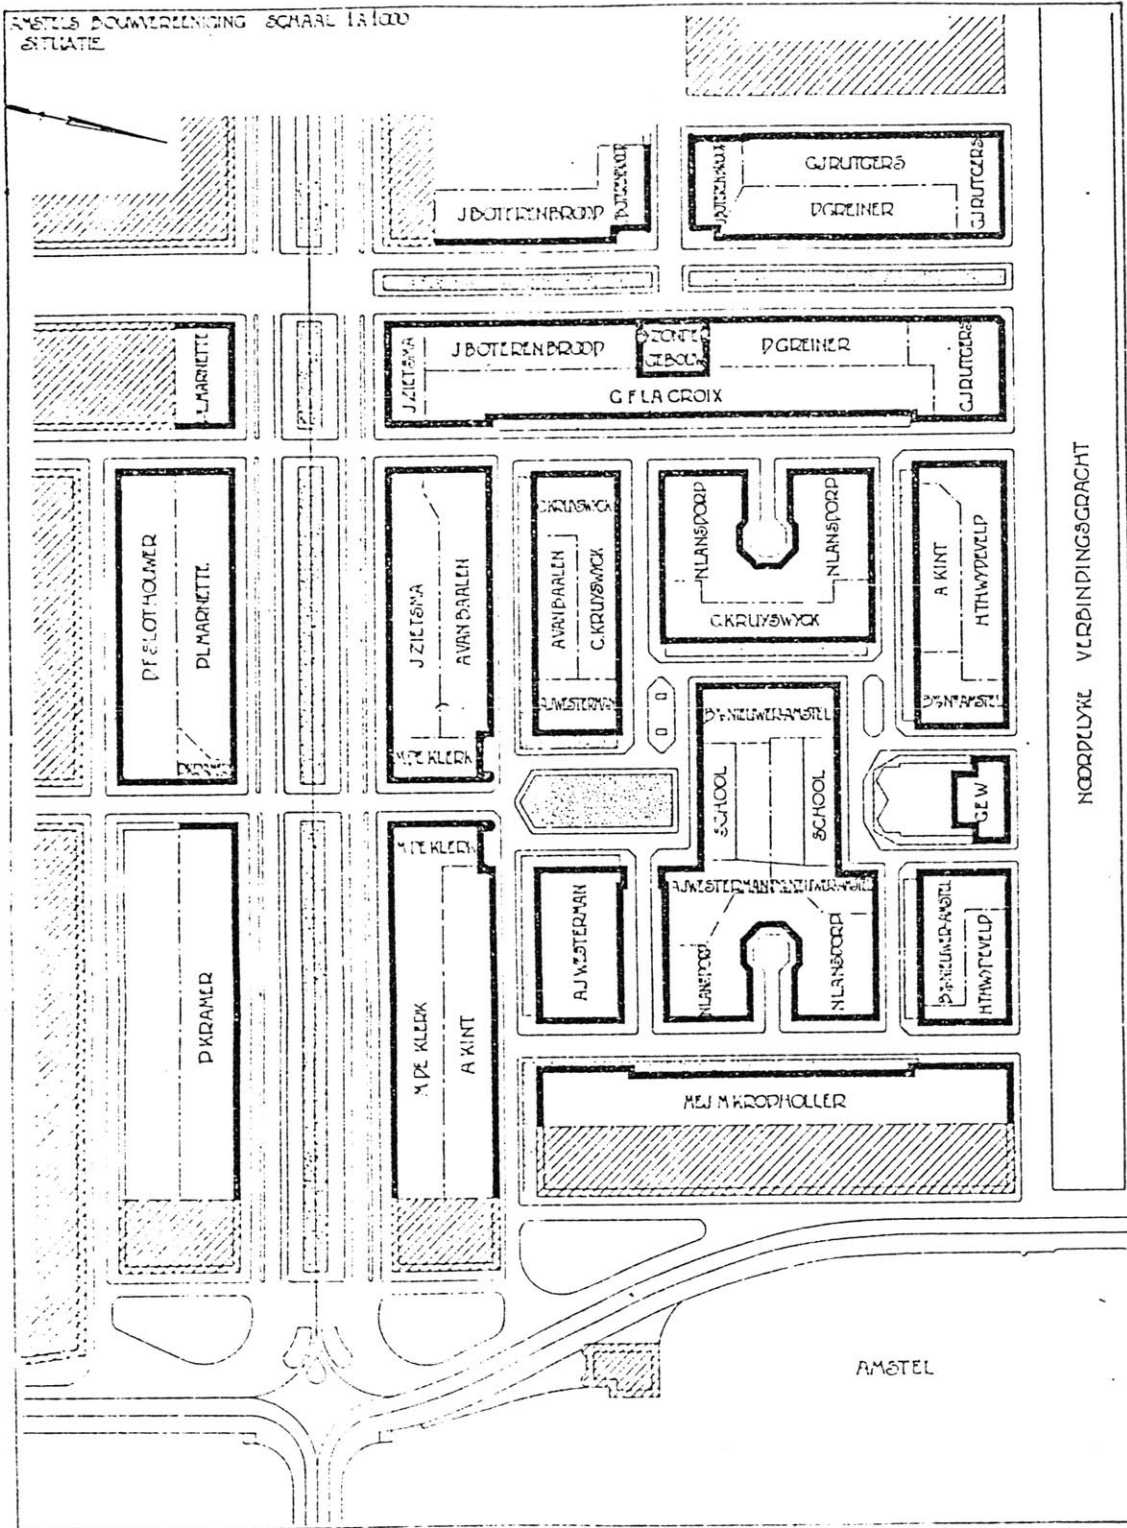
Amstels Bouwvereniging, Site Plan
